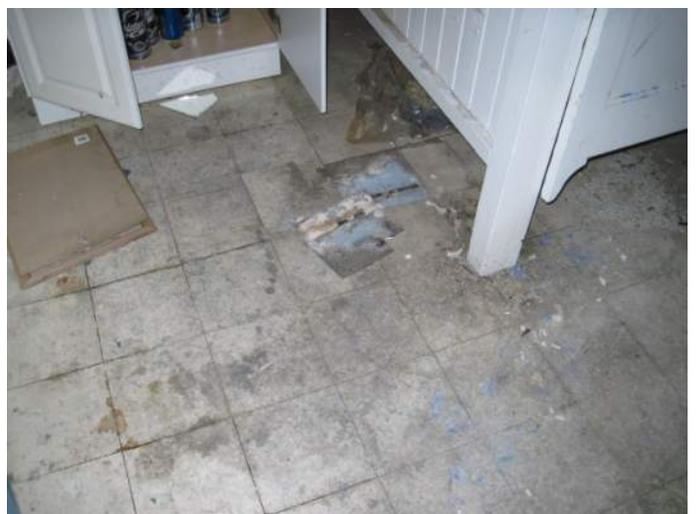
(6-27-17): ACM 9-inch floor tiles (sample set 09) located in bathroom within Site Building Room 22.
